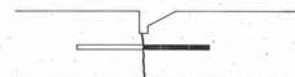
SECTION OF SHALLOW JOINT SPALLING
